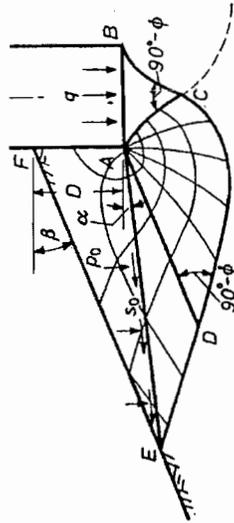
Plastic zones near rough strip foundation on face of slope (foundation failure)
